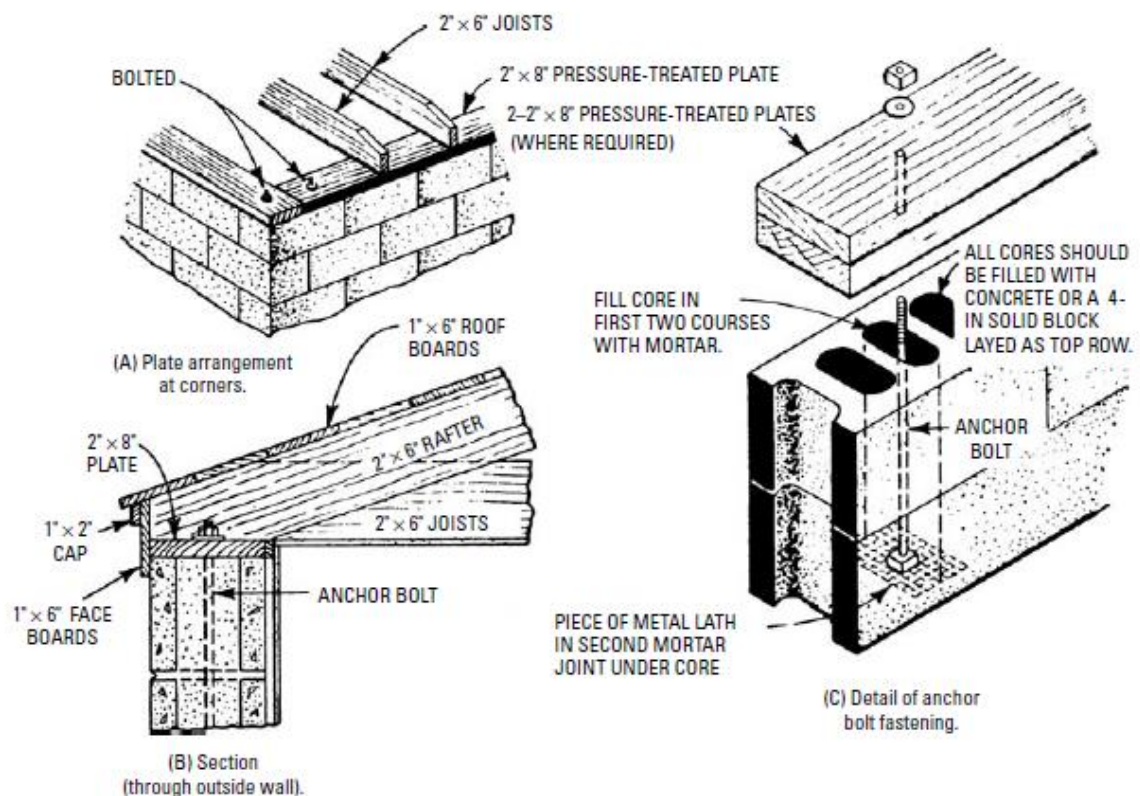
Details of methods used to anchor sills and plates to concrete-block walls.
